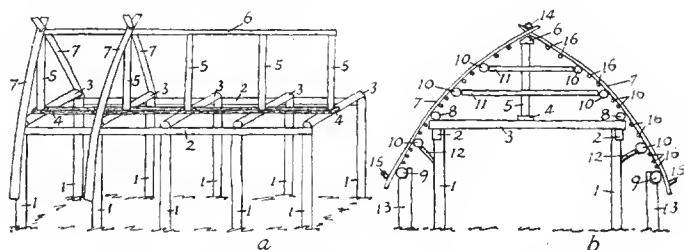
Long guest house (*fale afolau*): *a*, side; *b*, section through timbers; 1, supporting posts; 2, longitudinal main plates; 3, solid tie beams; 4, longitudinal squared beam (*tuitui*); 5, king posts; 6, main ridgepole; 7, principal rafters; 8, tie beam purlins; 9, wall plates; 10, ordinary purlins; 11, collar beams; 12, short strut (*te'e*); 13, wall posts; 14, upper ridgepole; 15, eave batten; 16, intermediate small purlins.
